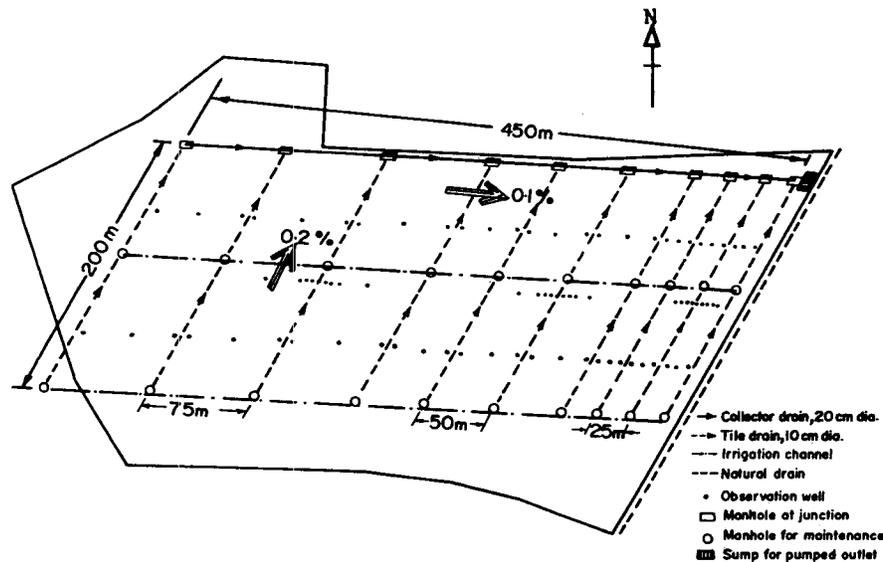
Layout of the subsurface tile drainage system at Sampla.
